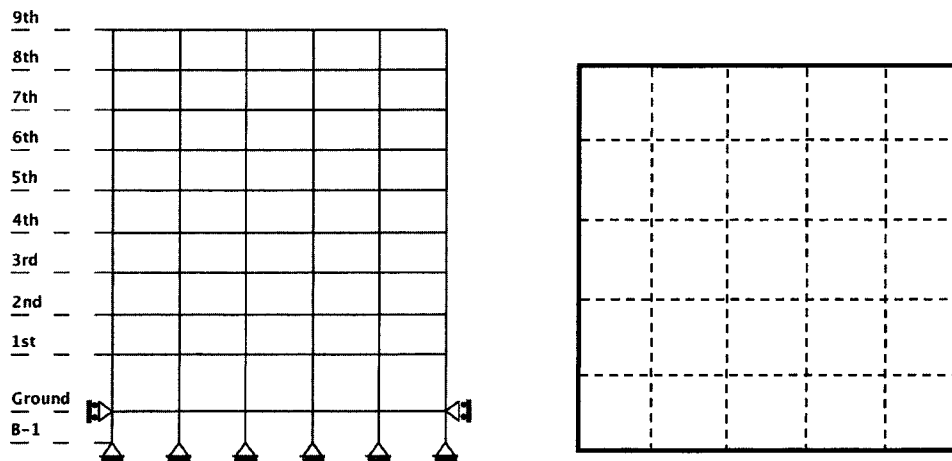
SAC LA-9 story elevation and plan (Gupta and Krawinkler 1999).
